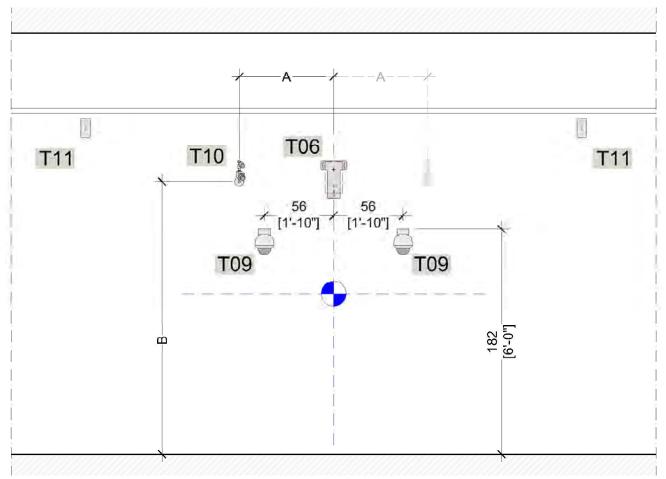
Treatment Room Sagittal Wall (Elevation)
